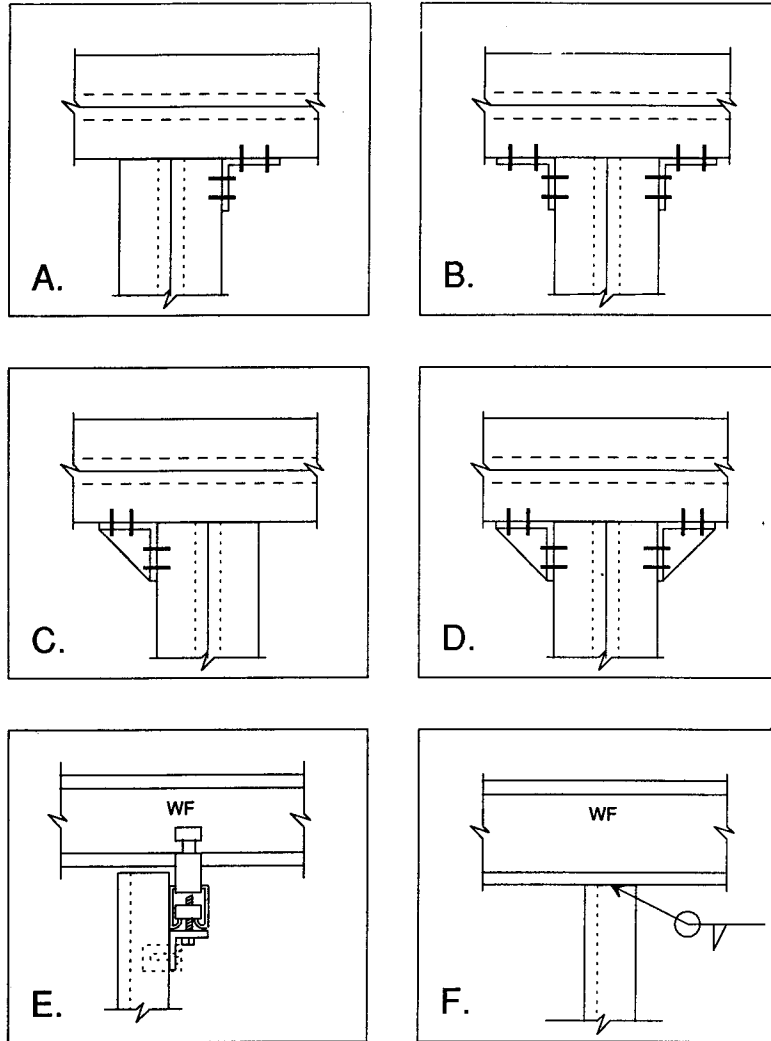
Examples of raceway support ductile connection details. A, B, C, and D are ductile connections of standard catalog light metal strut framing systems. E is a properly oriented beam clamp, configured as a pin-ended connection. Pin-ended connections are considered ductile. F is an all-around fillet weld on a structural steel angle section. If combined weld throat thickness is larger than the steel angle flange thickness, this may be considered a ductile connection. Connections C and D are ductile if the vertical bolts are into steel members as shown. If the vertical bolts are into concrete, the connections are not considered ductile.
